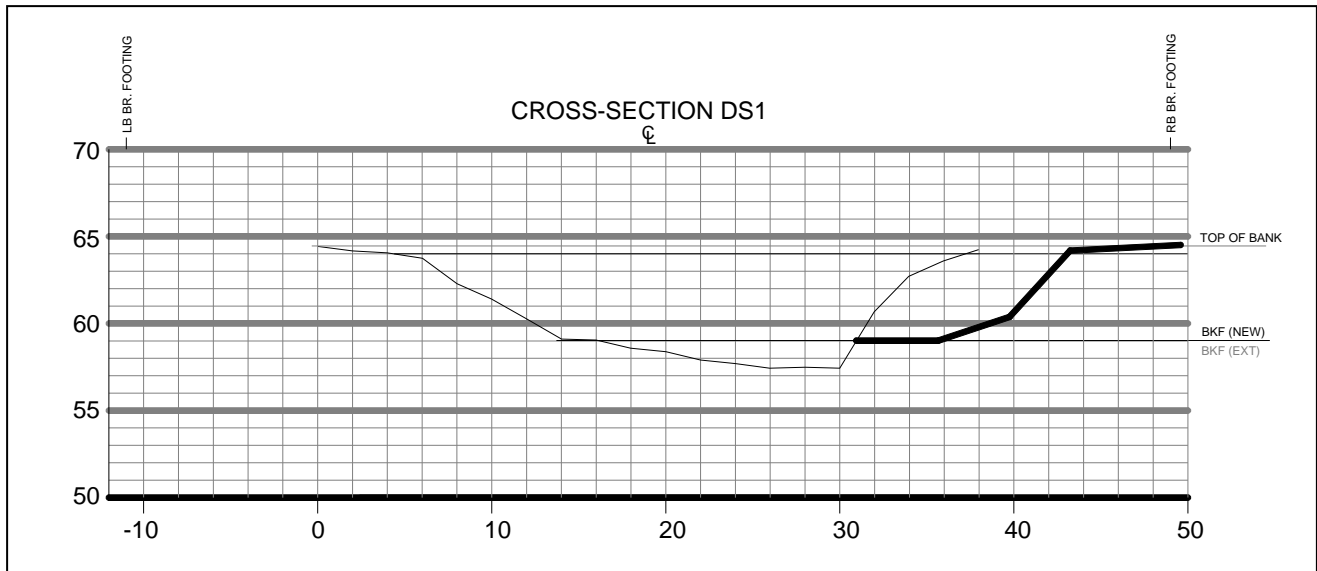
CROSS SECTION 1 DOWNSTREAM OF BRIDGE (DS1) SHOWING BRIDGE CENTERLINE AND FOOTING LOCATIONS. WATER TRAINING AREA IS ON STREAM LEFT.
